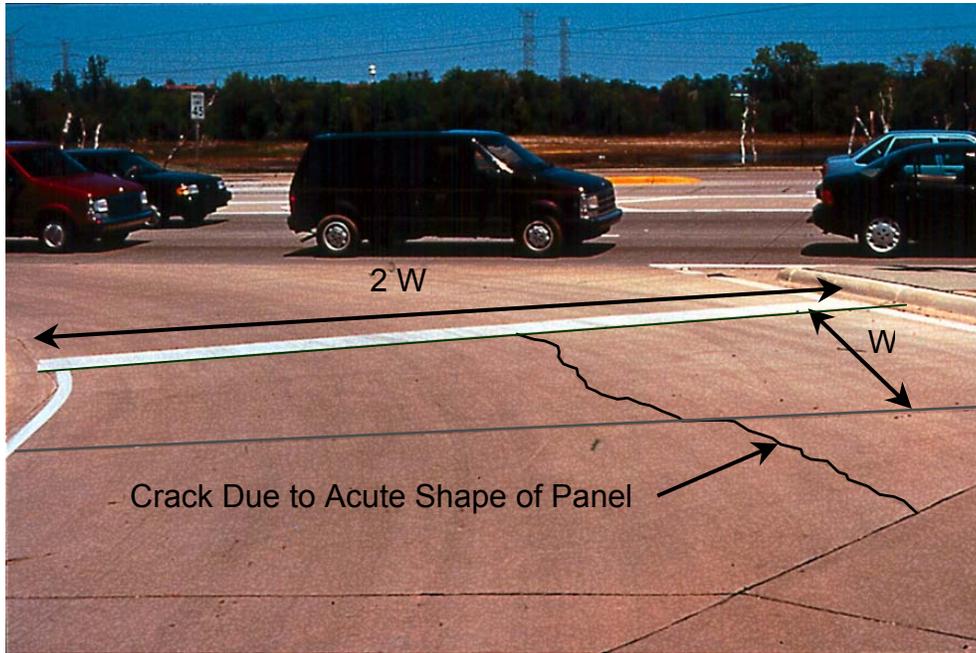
Cracking that will result when PCCP slabs are geometrically incorrect. Large, irregular, or rectangular slabs will crack (Photo courtesy of American Concrete Paving Association).
